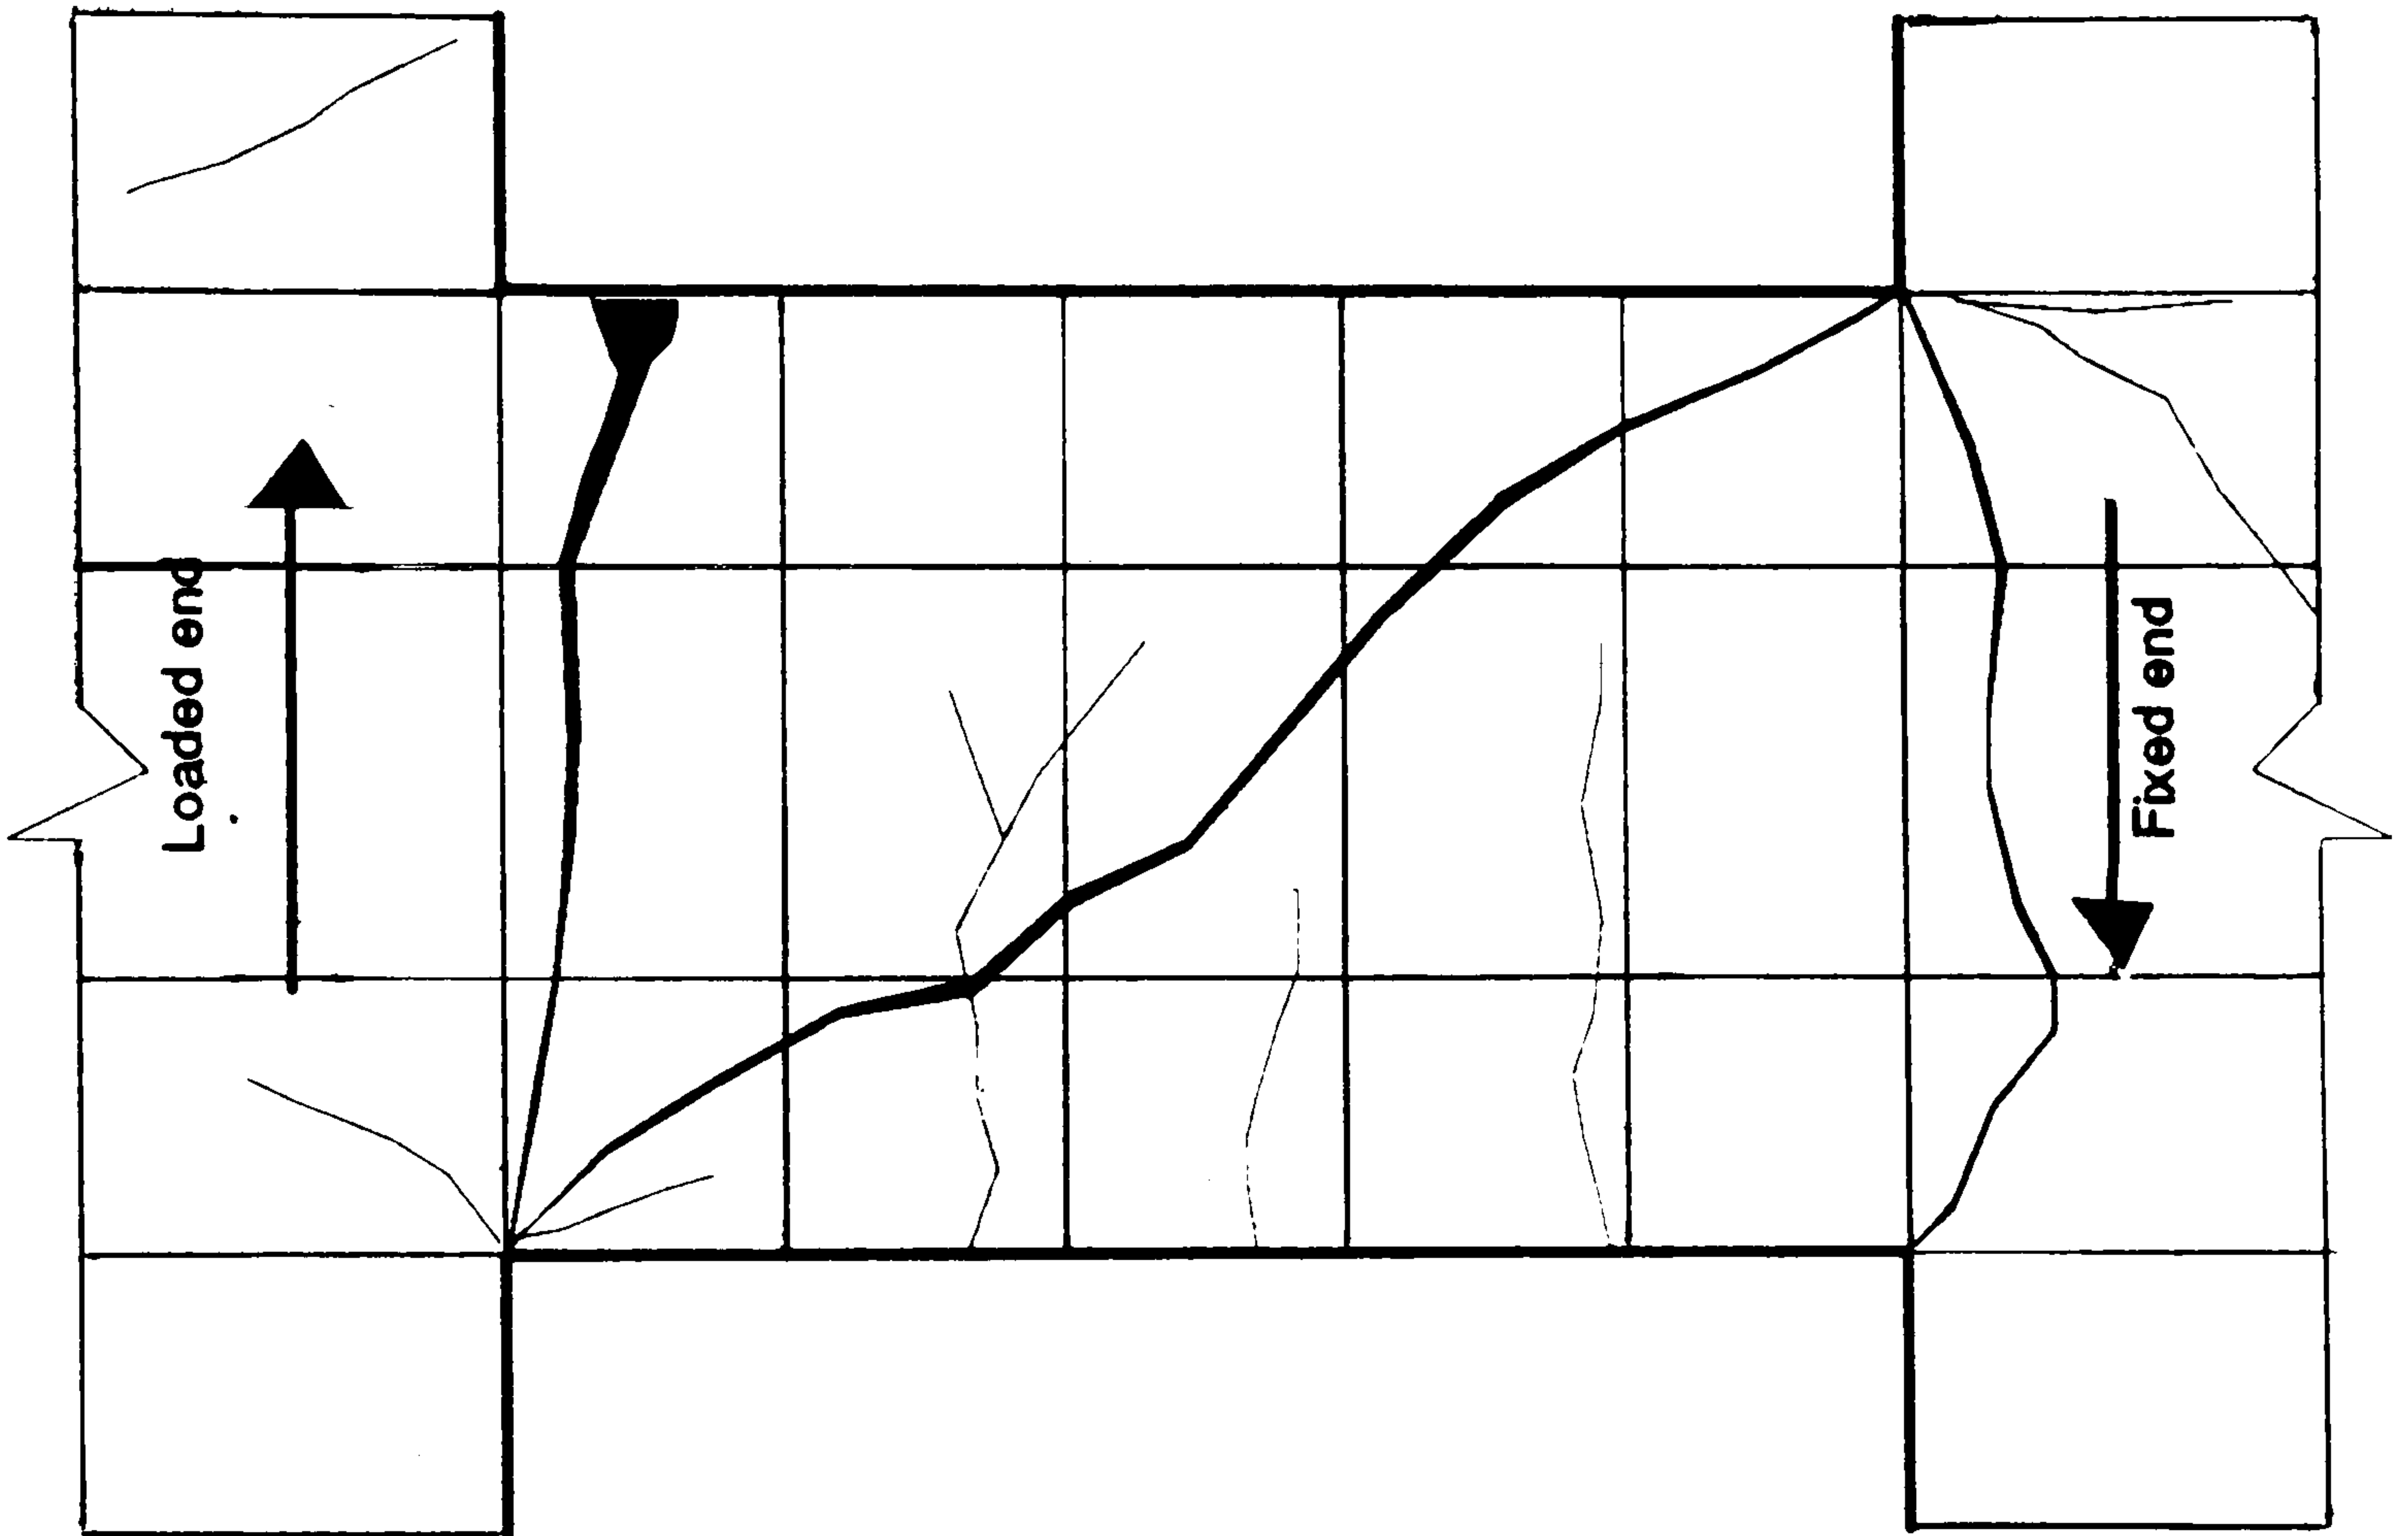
Failure mechanism and crack pattern for beam CBM2
